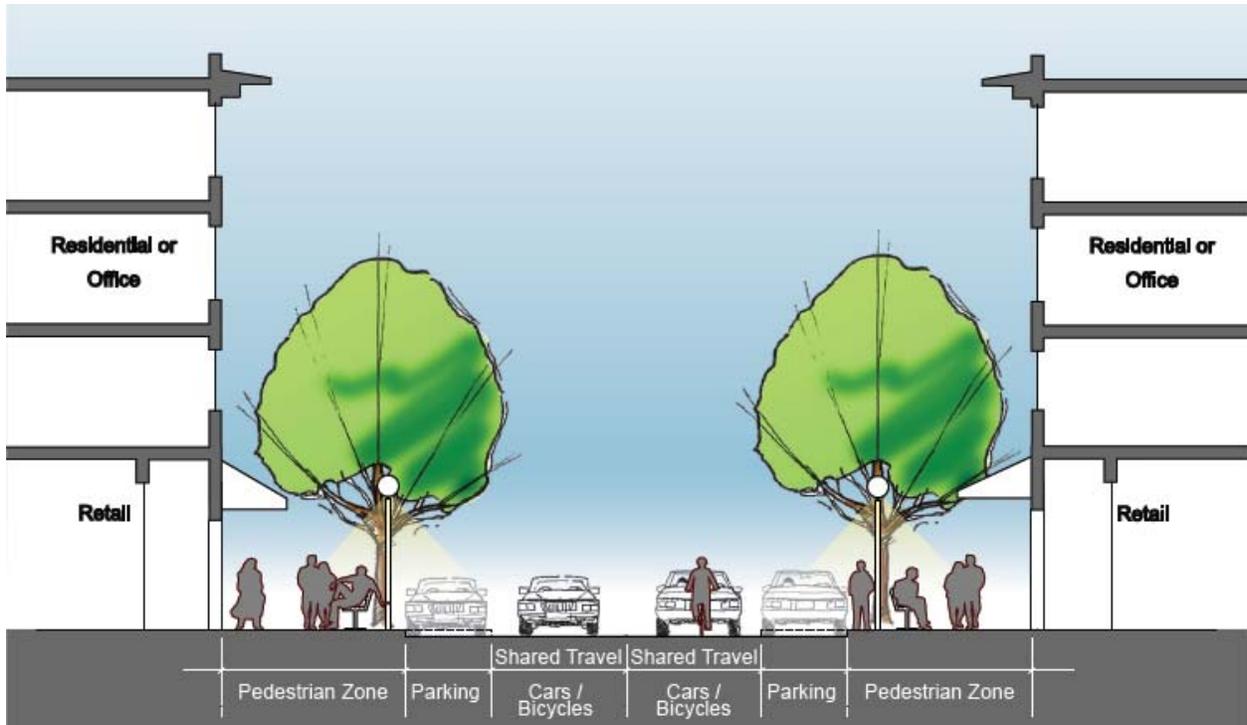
66th Street between Elvas Avenue and Folsom Boulevard, 67th Street between Elvas Avenue and Folsom Boulevard, and 68th Street between Folsom Boulevard and Q Street
